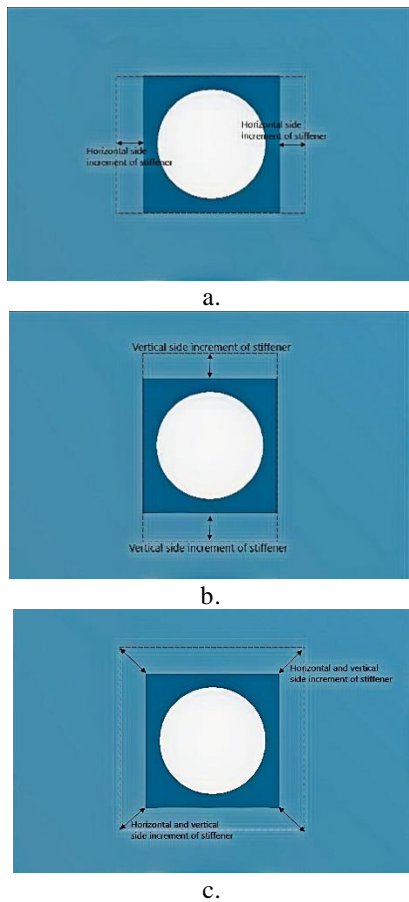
Area increment plan of stiffeners; a: Horizontal side increment plan, b: Vertical side increment plan, c: Simultaneous horizontal and vertical side increment plan
